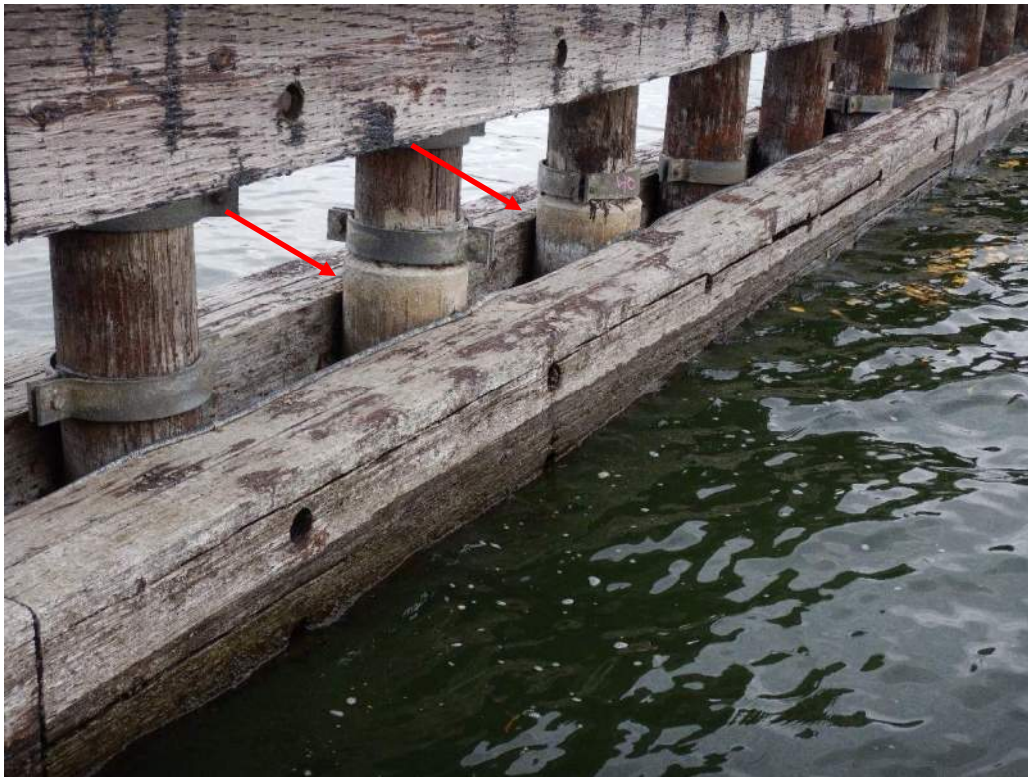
The bottom waler on the west side of the east fender wall is splitting in half, has severe checking, and has rotting between piles 37 and 42. Note the fibreglass jacket filled with concrete on piles 40 and 41.
